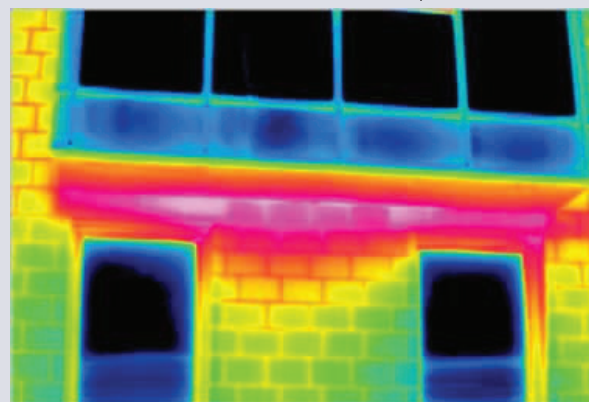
(1): Thermal bridge caused by structural beam below balcony window Image courtesy of RENSolutions.co.uk
